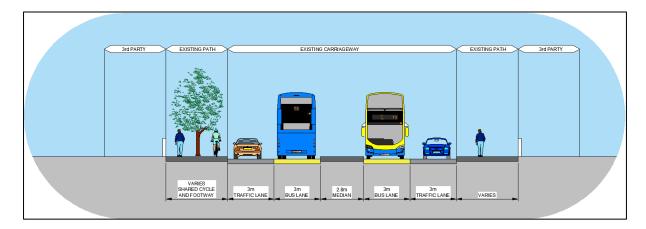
BG5 Cross Section Blessington Road (between Junctions 2 and 3).
